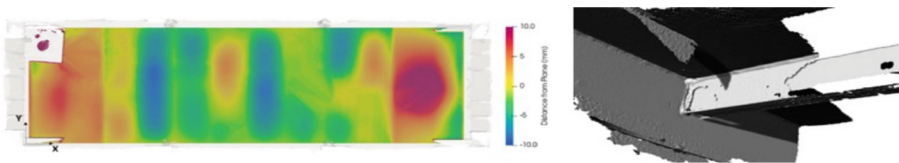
Deviation from the best-fit plane (left) and example of 3D reconstruction of some details (right).
